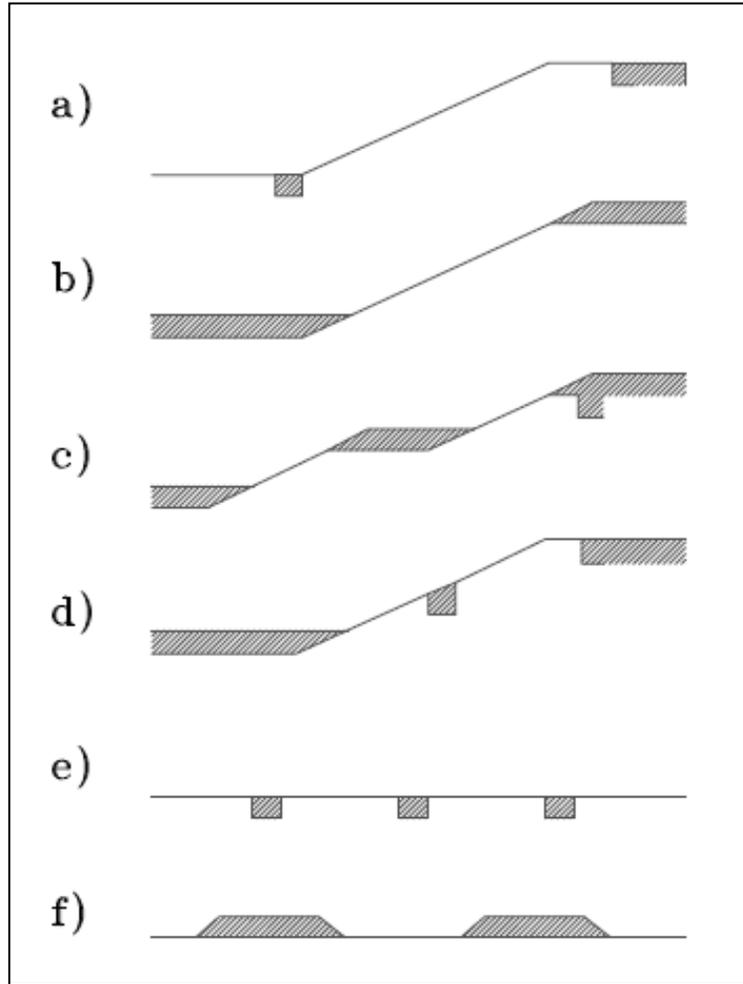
Design options for additional geomembrane anchorage (a) anchor trenches, (b) pavement or soil anchorage, (c) intermediate bench, (d) intermediate anchor trench, (e) basin anchor trenches, and (f) soil anchorage in basin.
